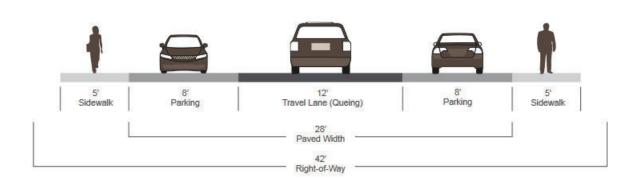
Local Street Cross Section from Brookings TSP Depicting 12 Foot Travel Lane for Two-Way Travel.
